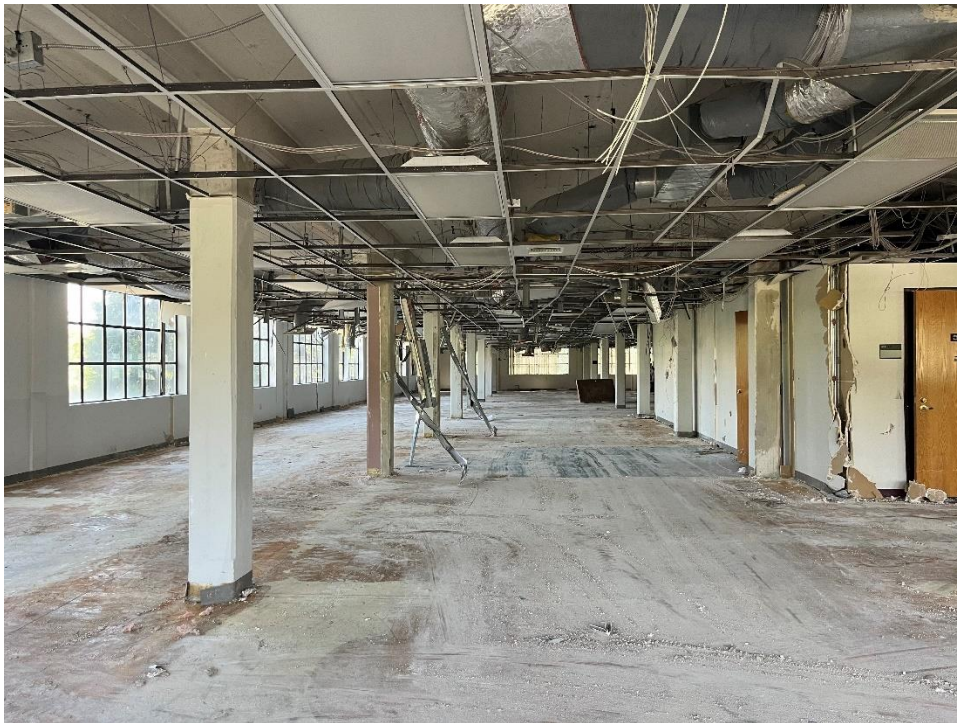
Second floor, 1936 west addition, view southwest, typical.
